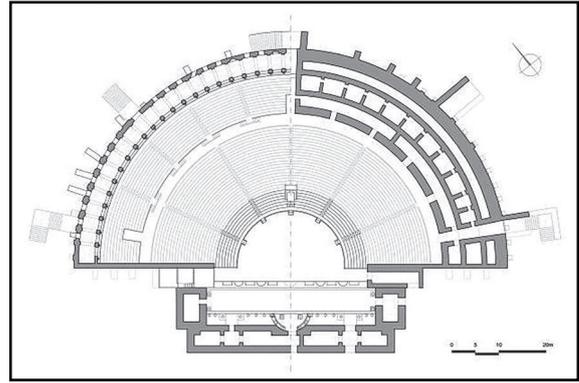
Ground plan of the second building phase. Drawing reconstruction.
